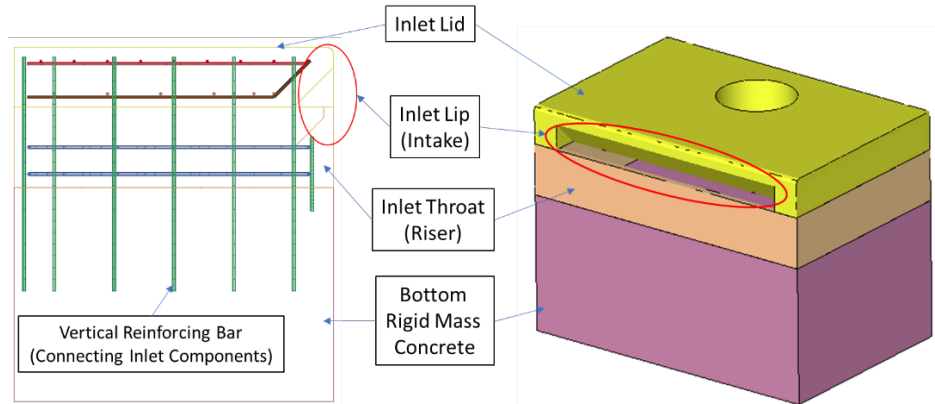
Finite Element Monolithic Inlet Model Components.
